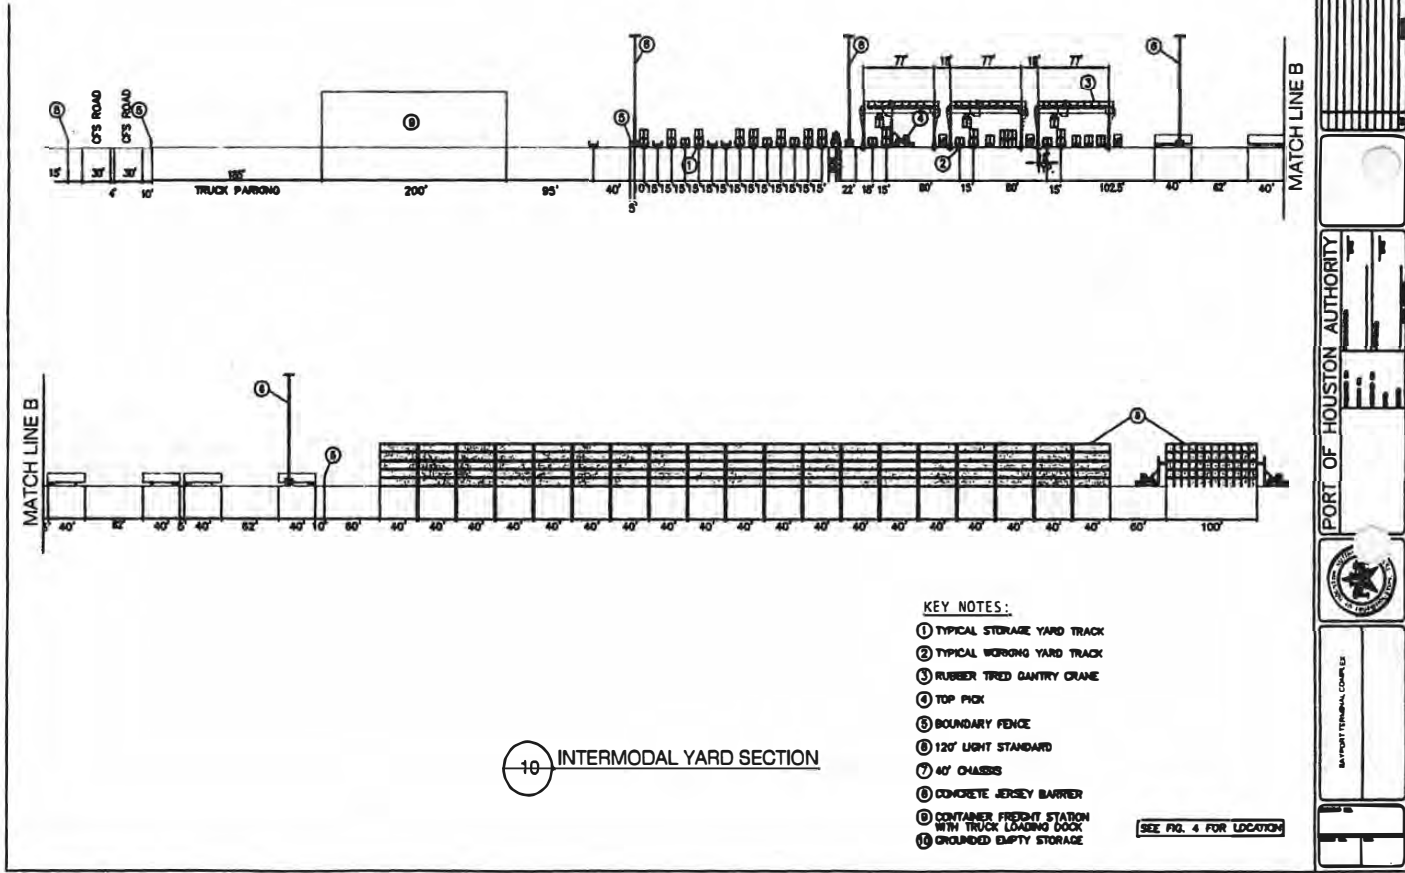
INTERMODAL YARD CROSS SECTION
